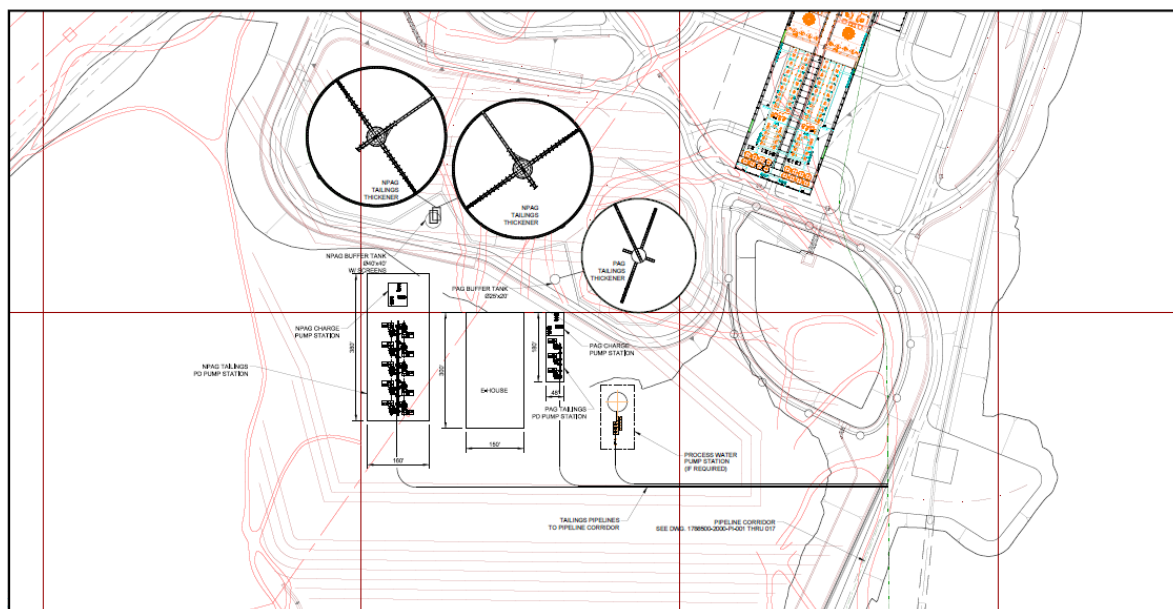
General Layout of the Peg Leg Pipeline Facilities at the West Plant Concentrator Site
